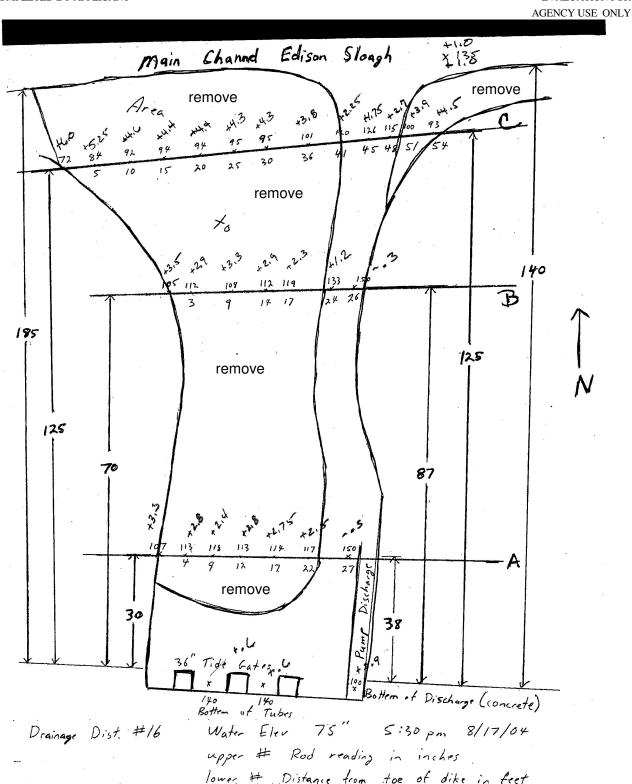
Tidegate Complex 25 – Site Plan and cross-section locations.
